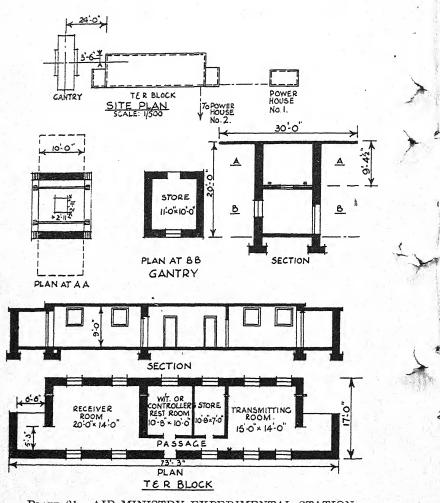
AIR MINISTRY EXPERIMENTAL STATION—TYPICAL LAYOUT
